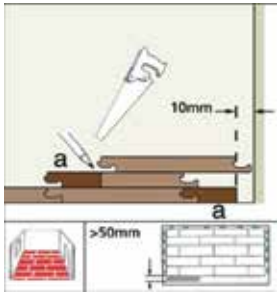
Board a in diagram is placed onto the last row of installed boards. Then another board is placed over the top of board a. Position this board, taking into consideration the locking system and expansion gap and mark board a as illustrated. Then cut board a to fit last row. Board a must not be smaller than 50mm.
